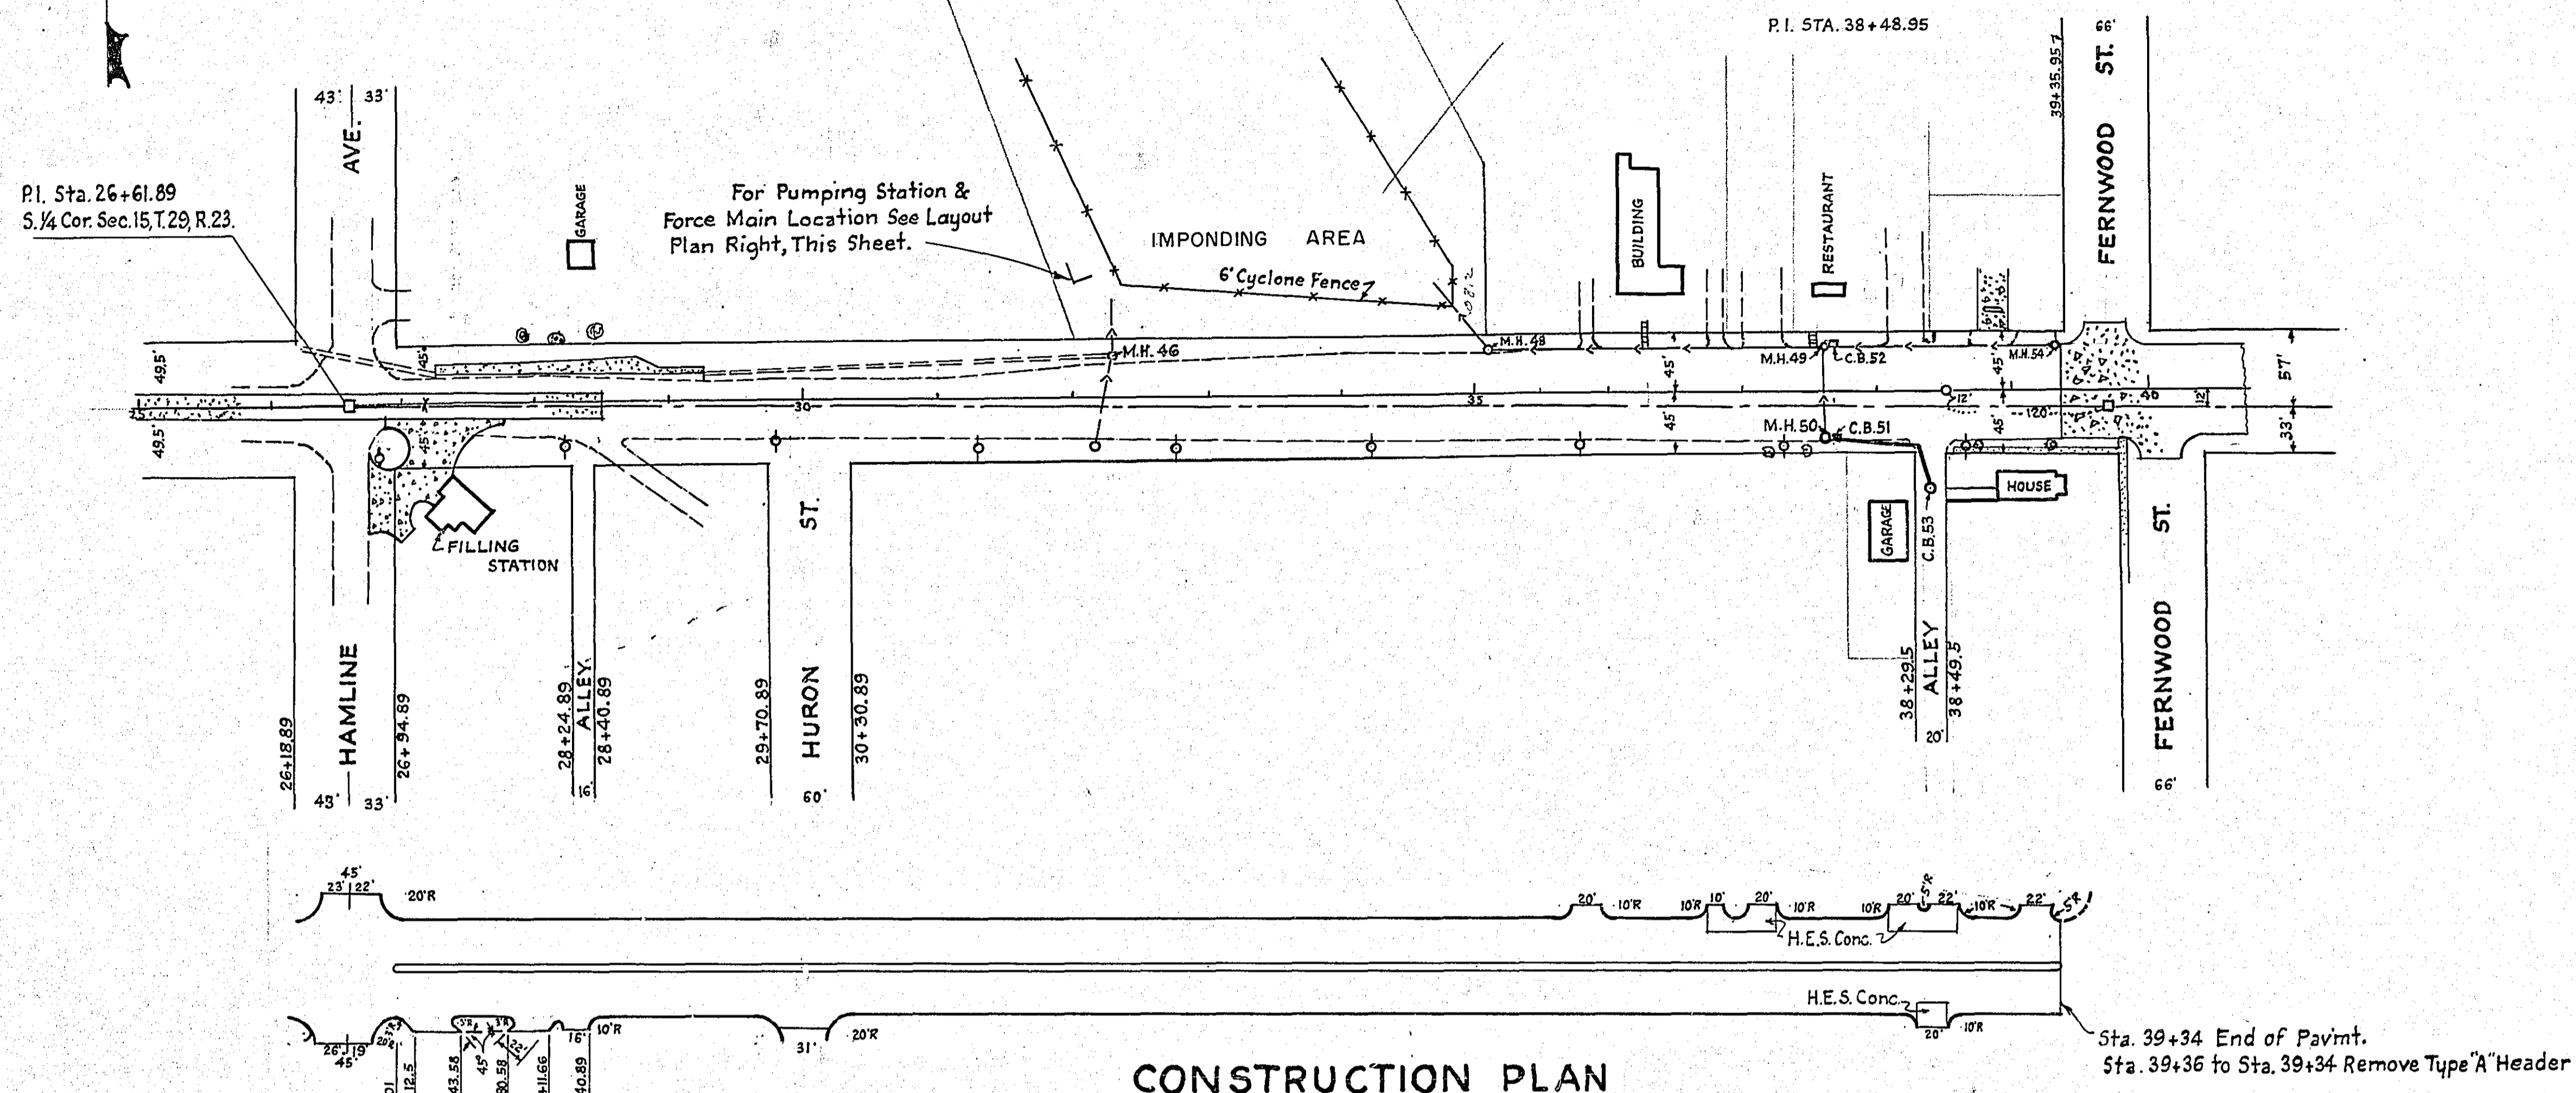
PLAN PROFILE (S.D.P. 1-4) STANDARD
